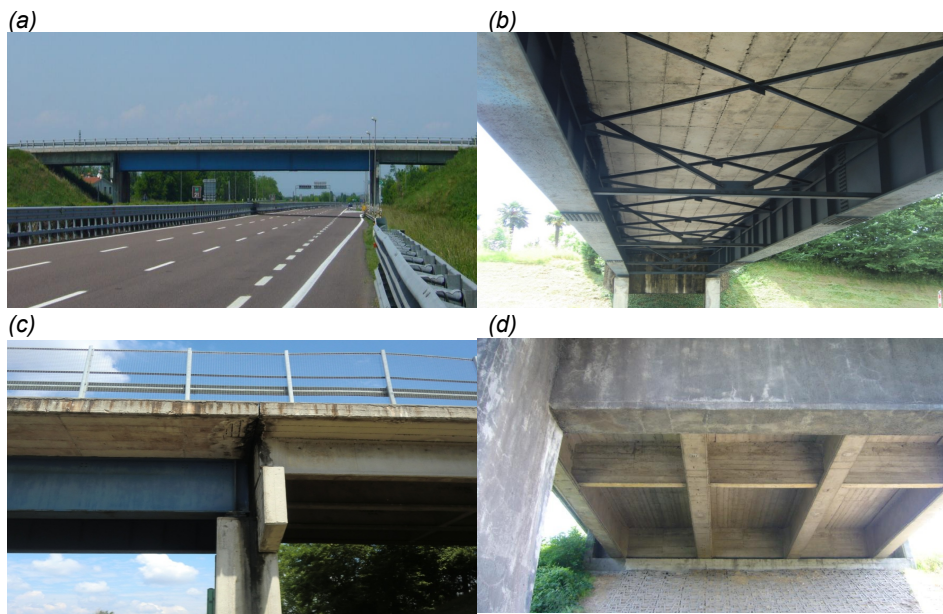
General view (a), main steel span (b), lateral reinforced concrete spans (c) and detail of the beams bearing (d) of the analysed A27 highway bridges.
